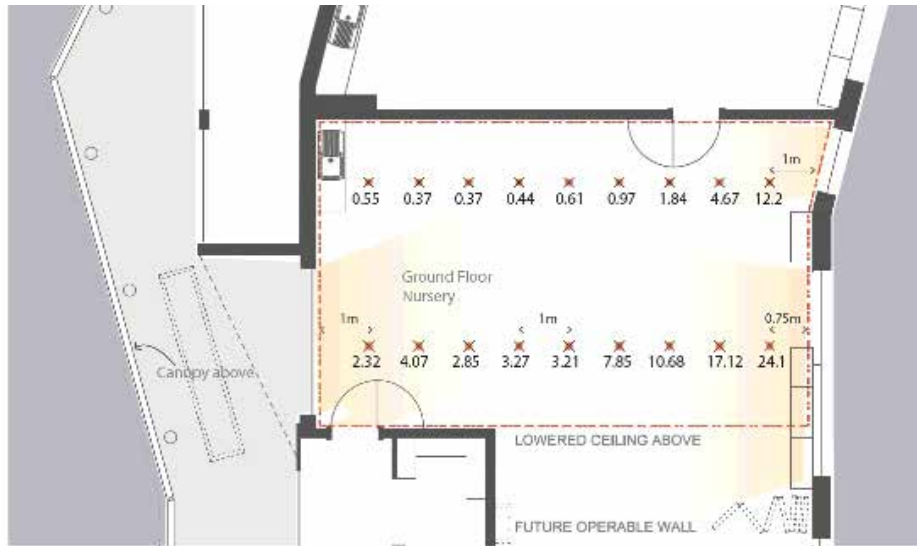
Ground Floor Classroom Daylight Factor (%) mapped onto a plan of the room- showing a poor uniformity of daylight.
